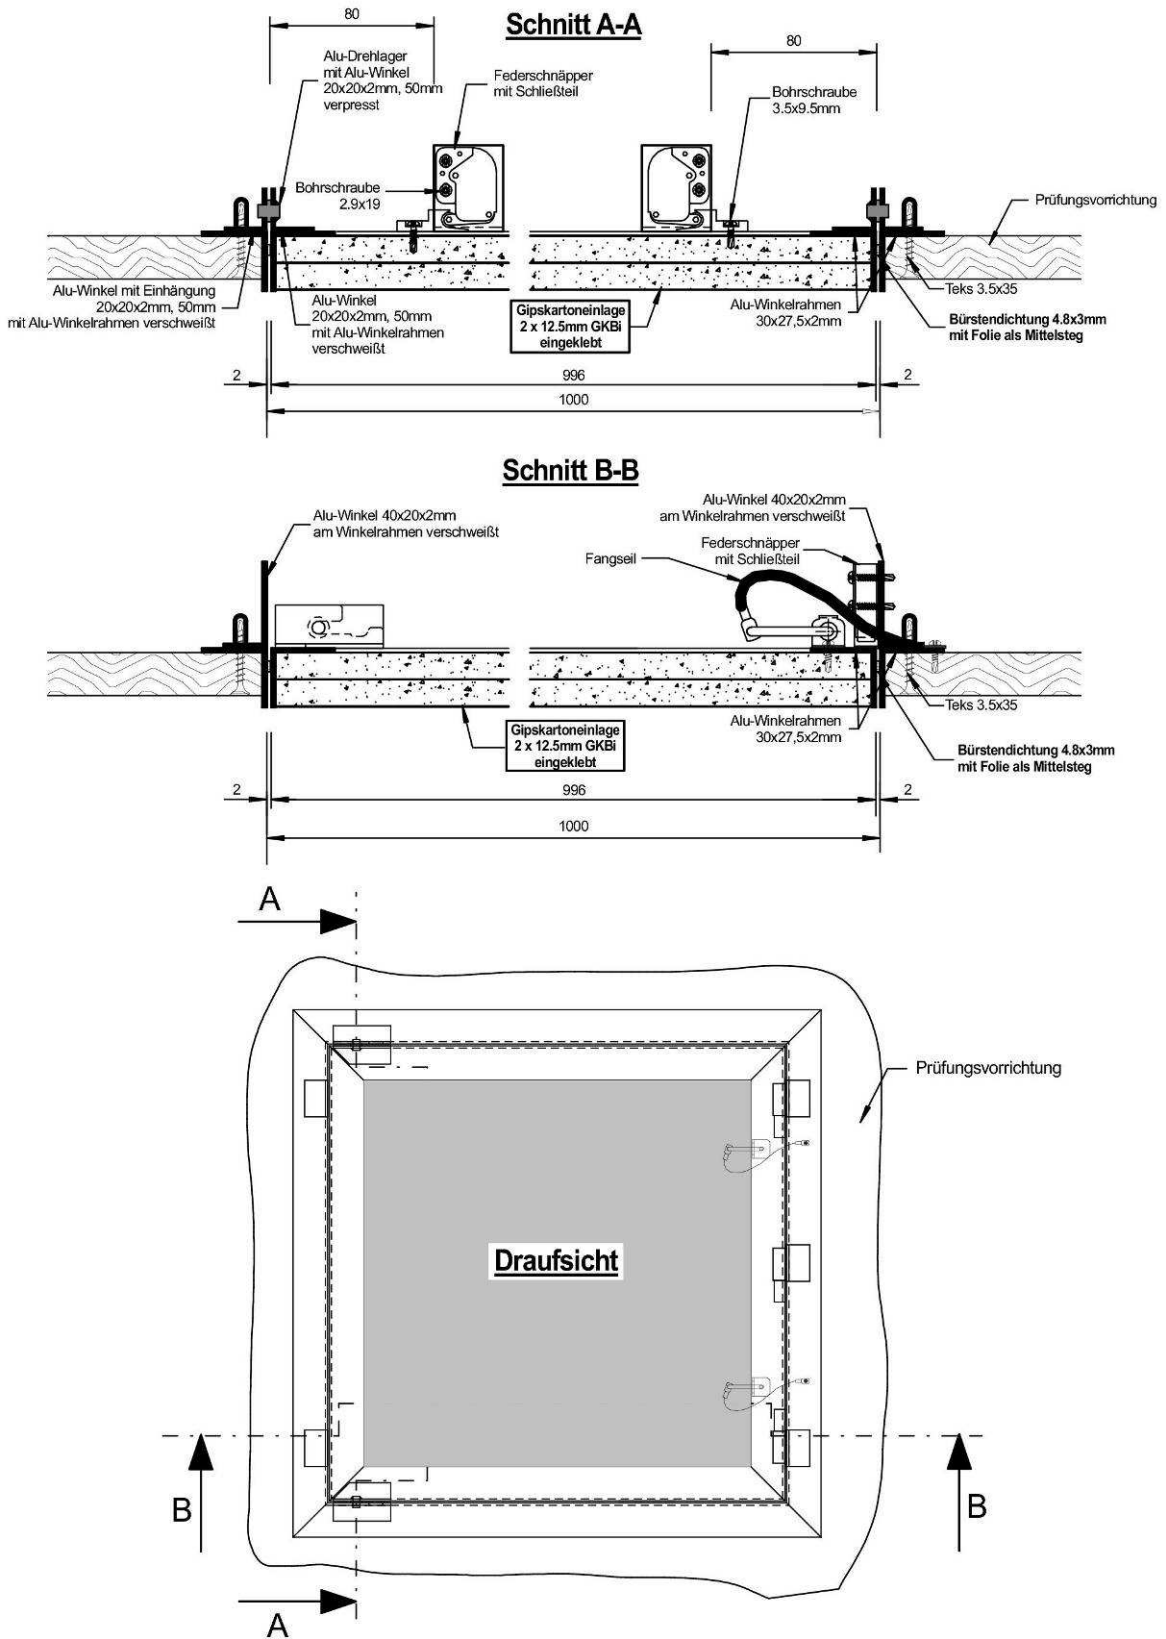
Drawing - referring to test specimen 1 (panel with 25 mm GKBI)
